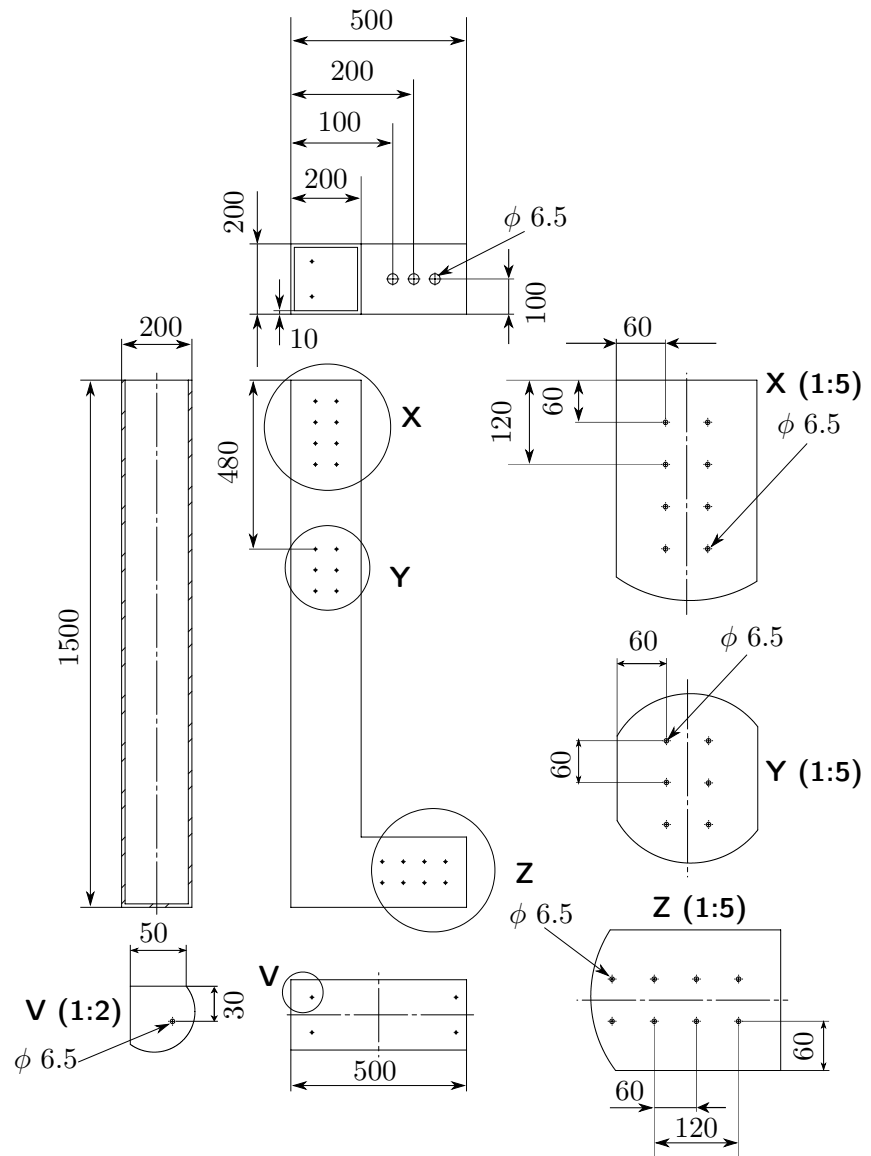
L-shaped test specimen geometry with dimensions in mm.
